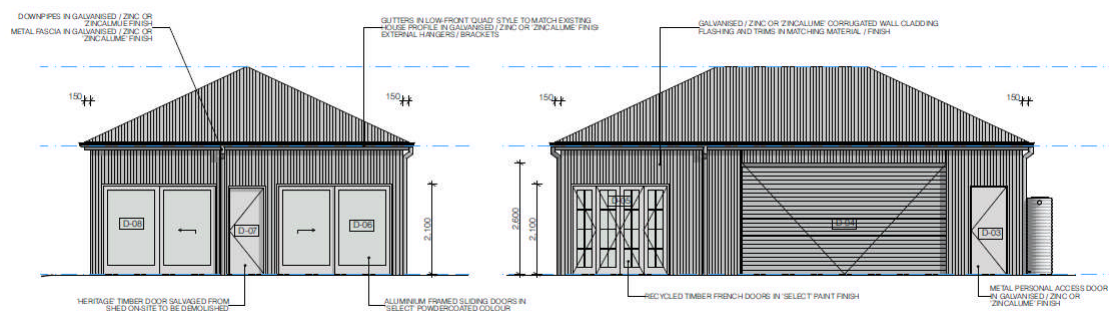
Southwest & southeast elevations of the Garage. (Dwell Building Design)
